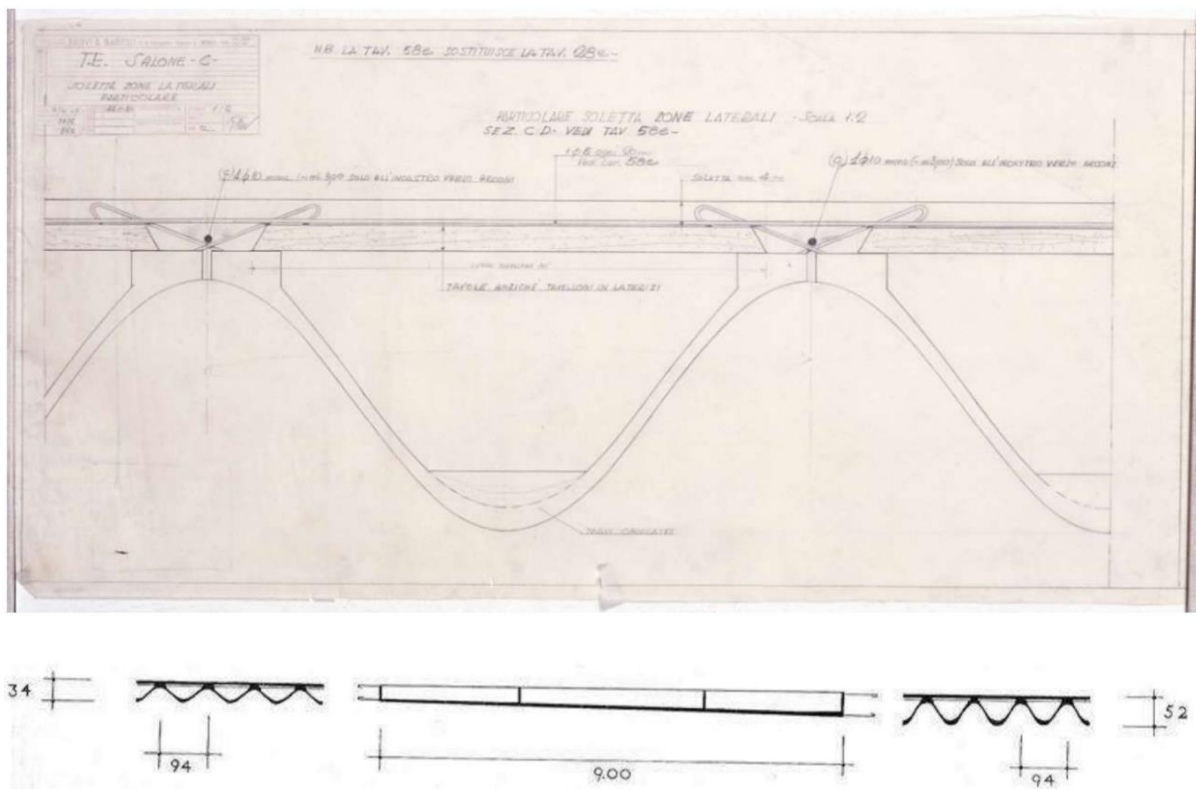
Section of the perimeter floor in ferroceмент source CSAC Archive Parma
